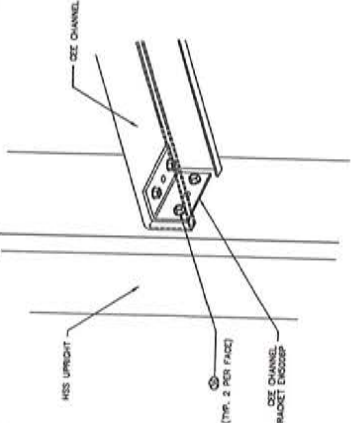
BRACED BAY TO UNBRACED BAY AT BOLT IN WEB
